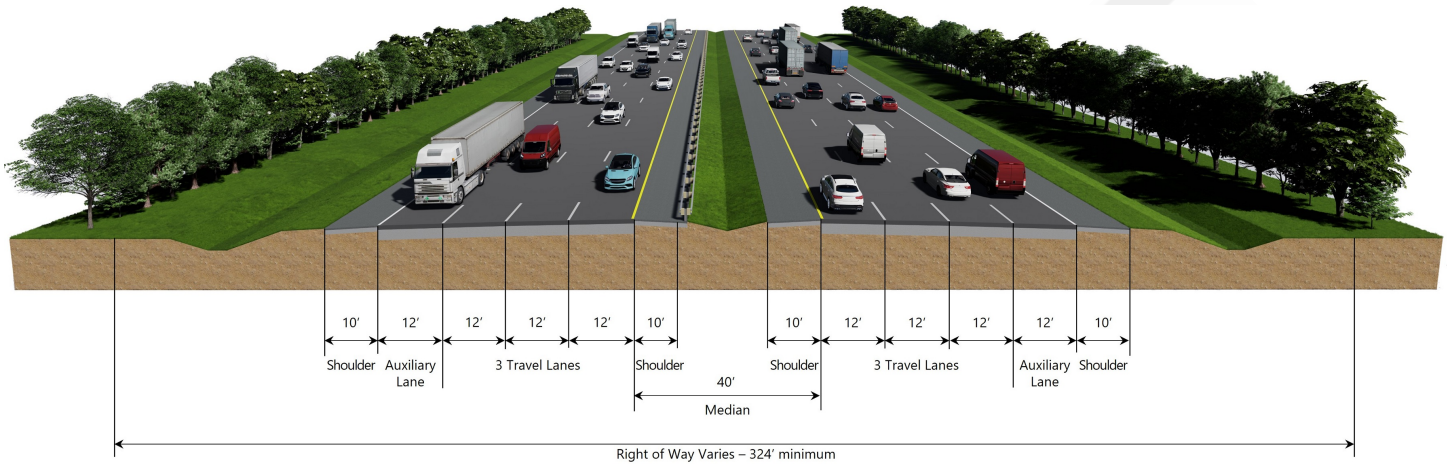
I-95 Existing Typical Section from Philips Highway (US 1) to Southside Boulevard
